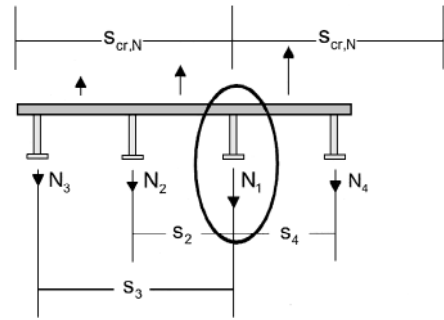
Example of an anchor channel with different tension loads on each anchor (Kraus (2003))
